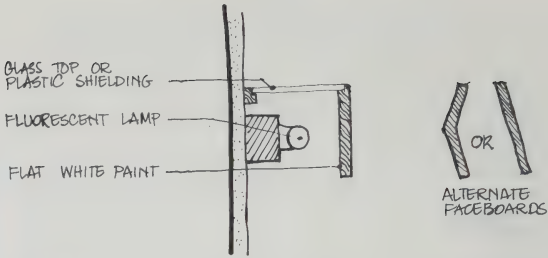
FLUORESCENT LAMP WITH WALL BRACKET
